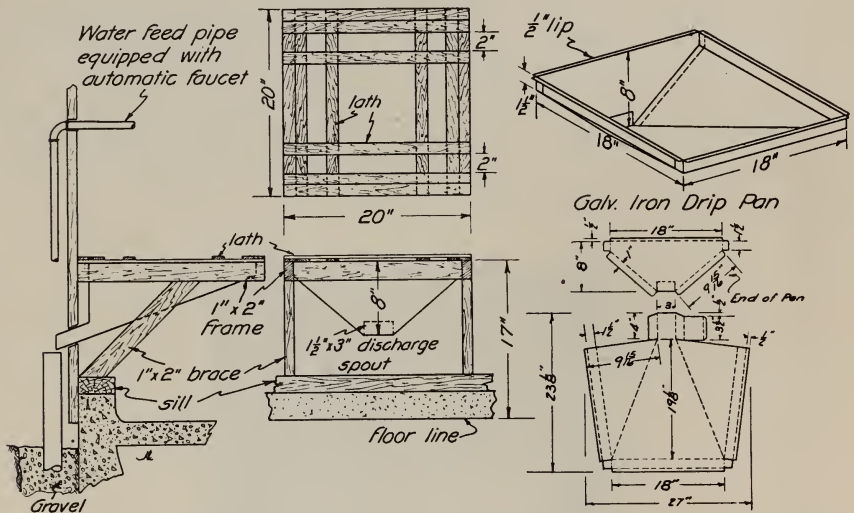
Plan showing construction of wall bracket, drip pan and removable slat platform for waterer illustrated in figure 100.
